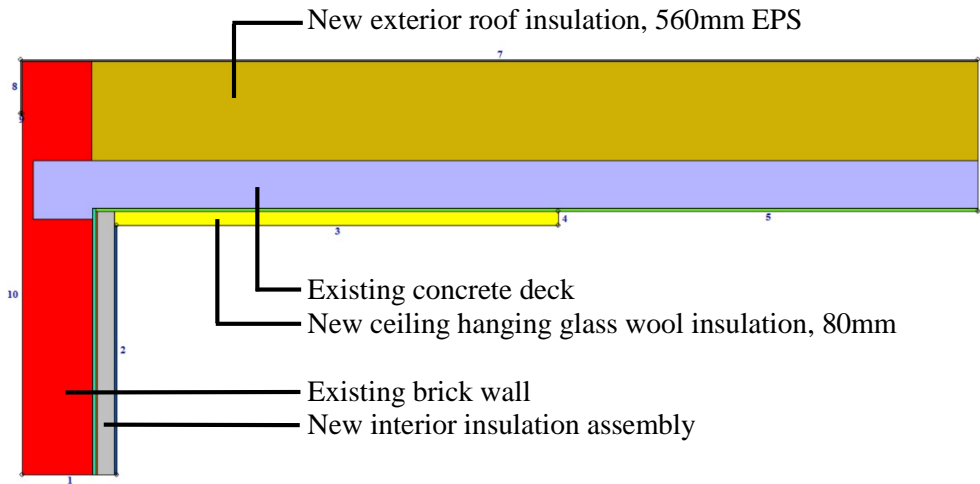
Roof eave junction, wall assembly H (Illustration by the author)
